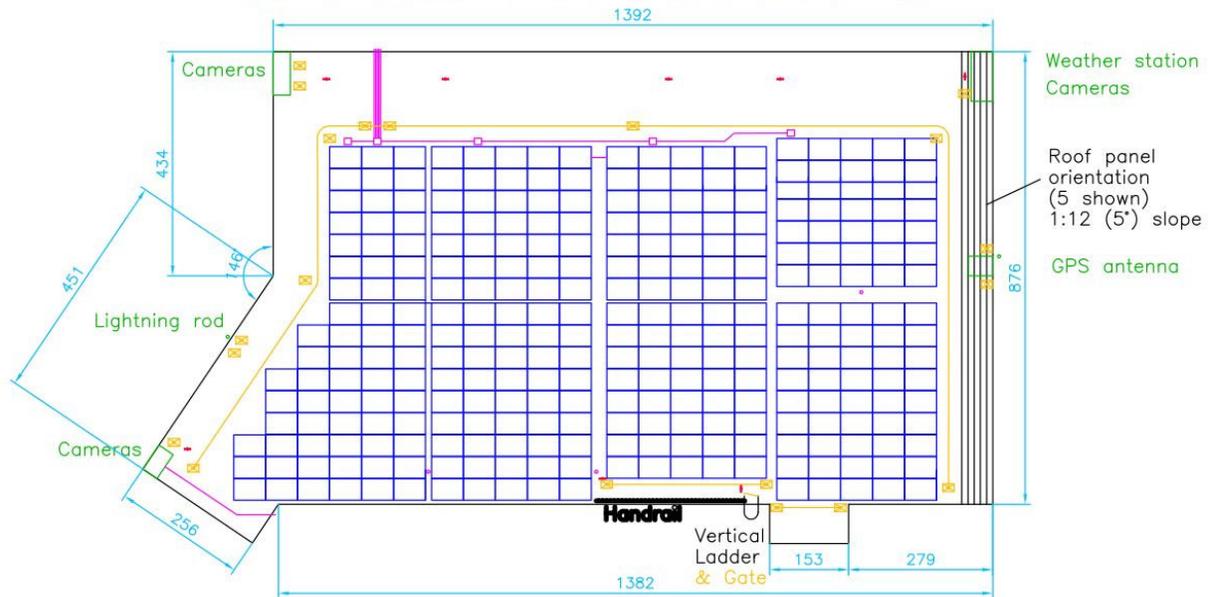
Plan view of the Support Facility roof showing the lifelines, tie off points, and handrail locations.
